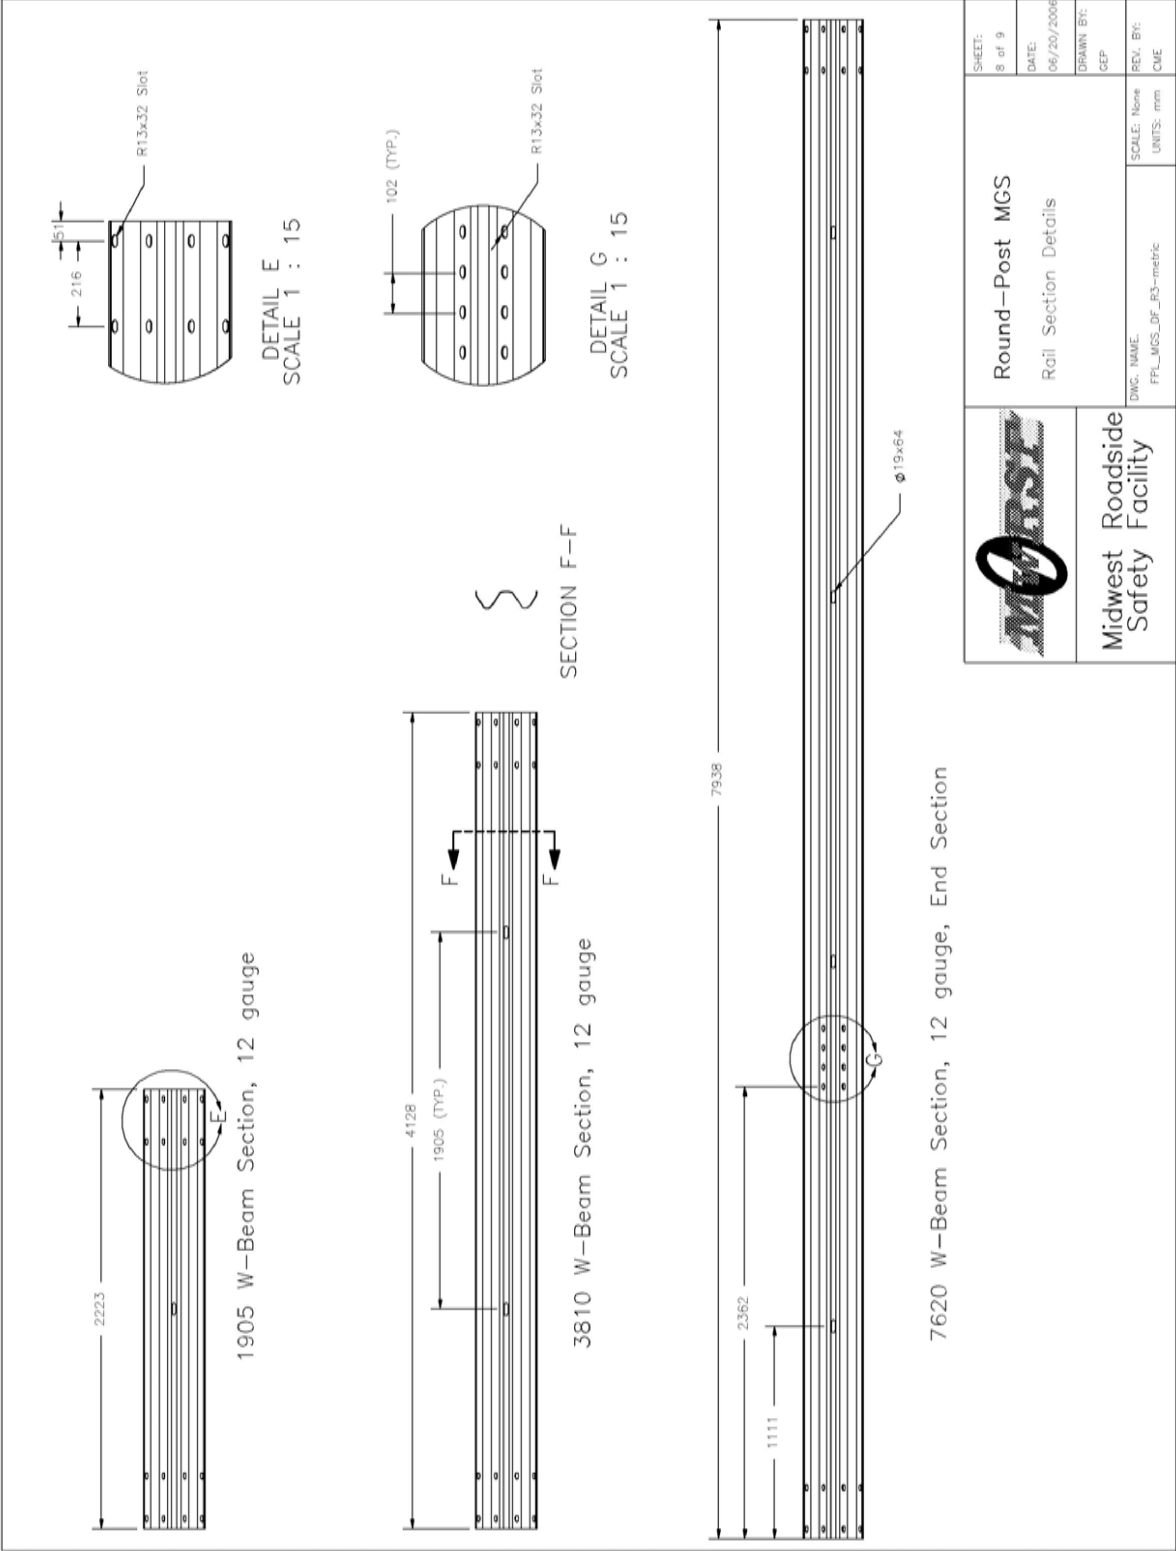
MGS Round Post Douglas Fir Details – Rail Section Detail
